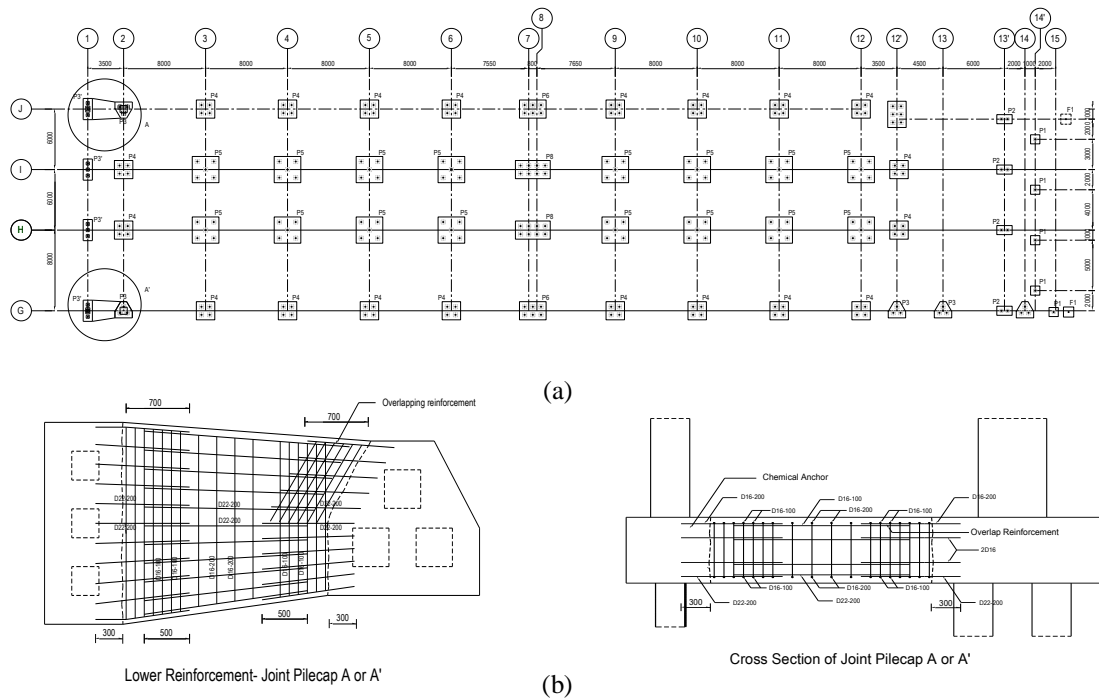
Layout Retrofitting Foundations: (a) Layout, (b) Reinforcement
